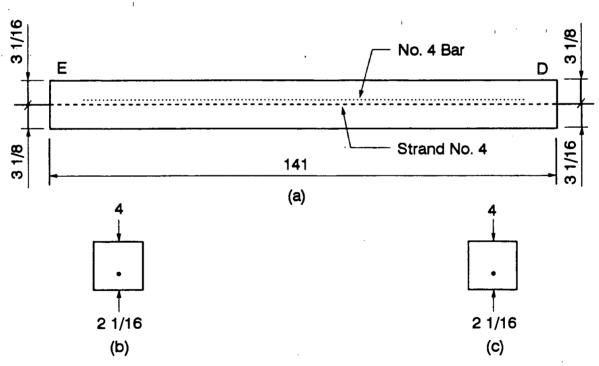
Specimen No. 17-6.0DC-12 (dimensions shown in inches):
